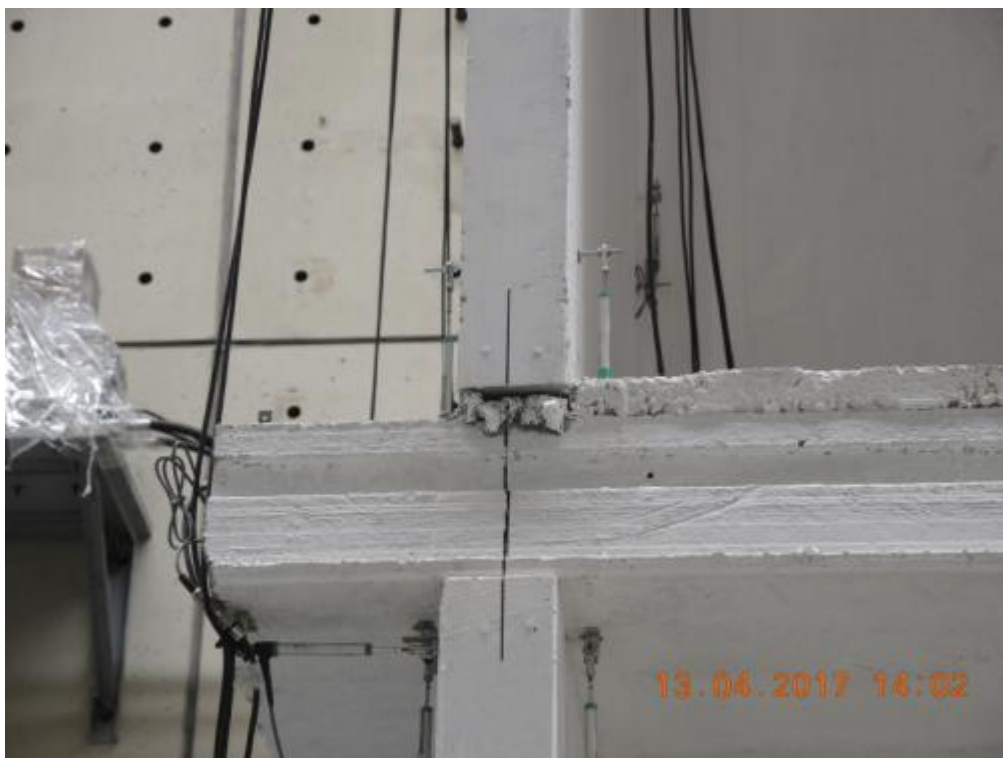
Detail of the first-storey floor slab after Test run #6 – top displacement = 11.2 mm.
